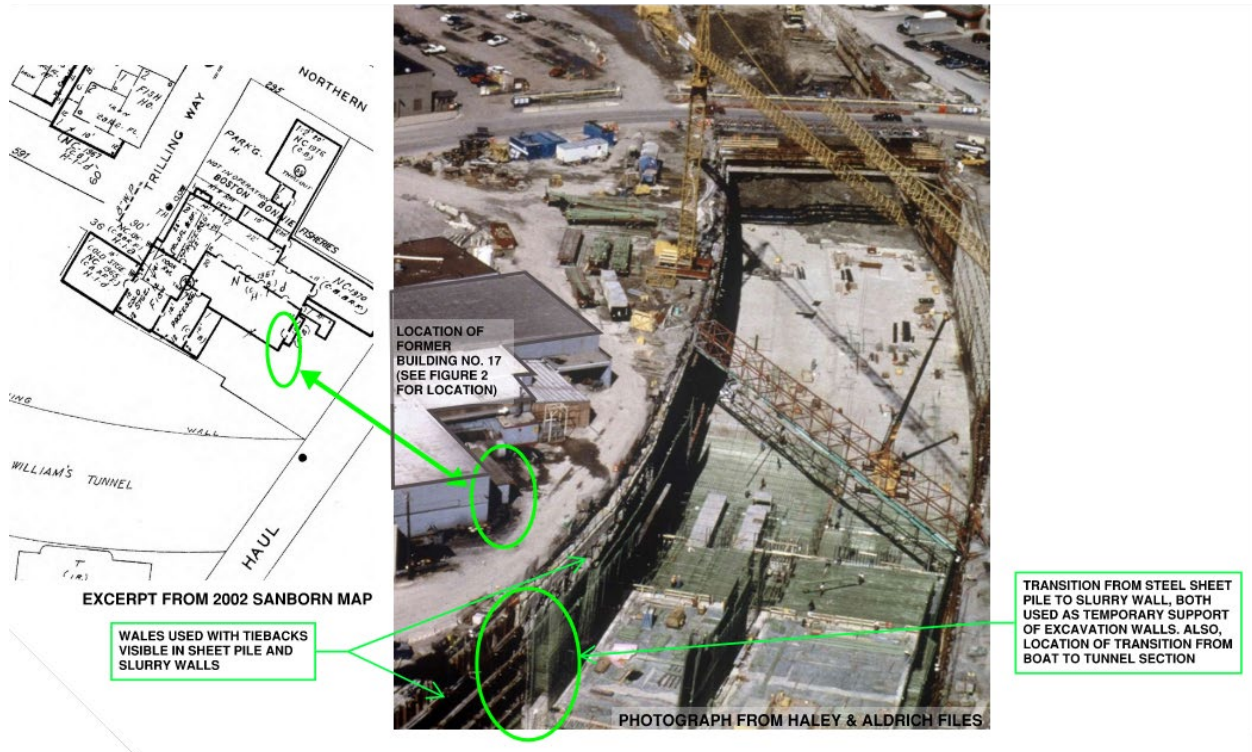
Excerpt of 2002 Sanborn Map with Ariel Photo of I-90 construction adjacent to the site
